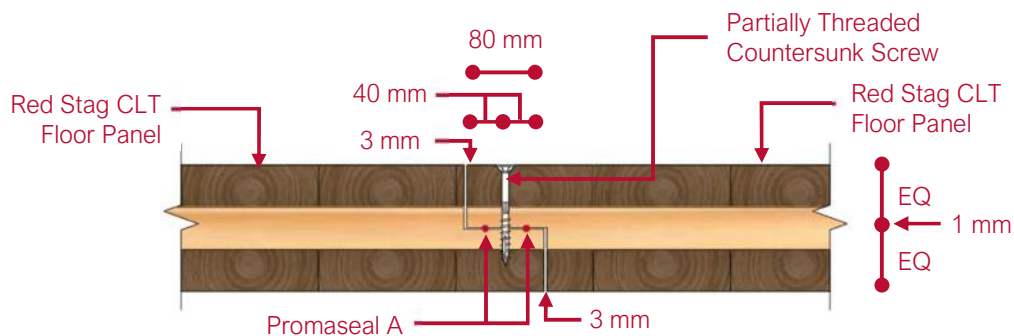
Red Stag three (3) layer CLT floor to floor half-lap joint connection.
